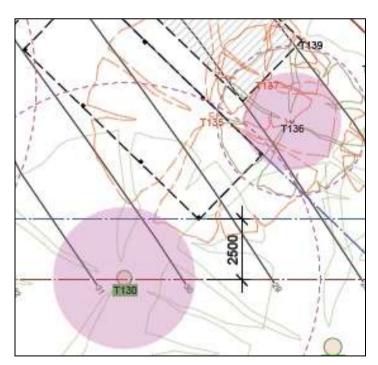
Stage 2 Plan excerpt, (Source: Proposed Plans by Design Waves, Rev A, 21/09/21)
